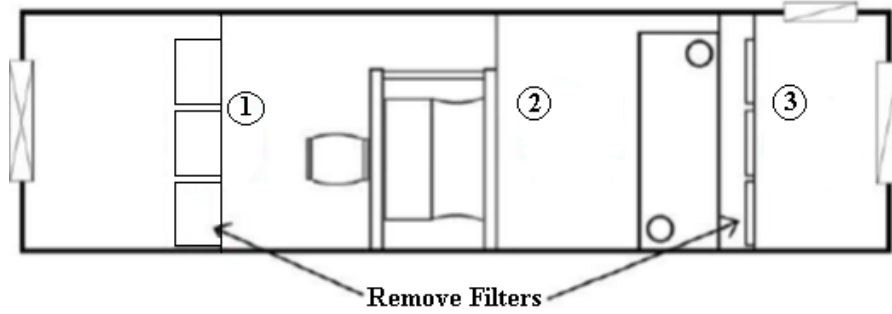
AIR HANDLING UNIT WITH NO PRESSURE CHANGE WALL
